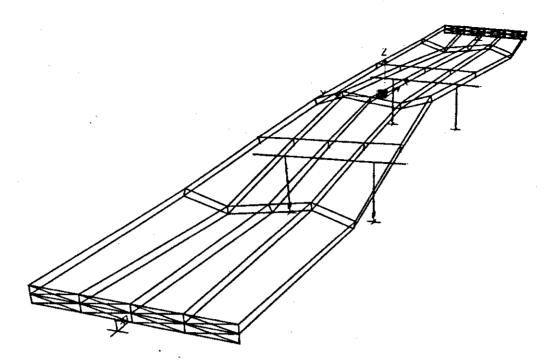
Mode 5, Period 0.0729 Seconds (New Wahite Ditch Bridge)
